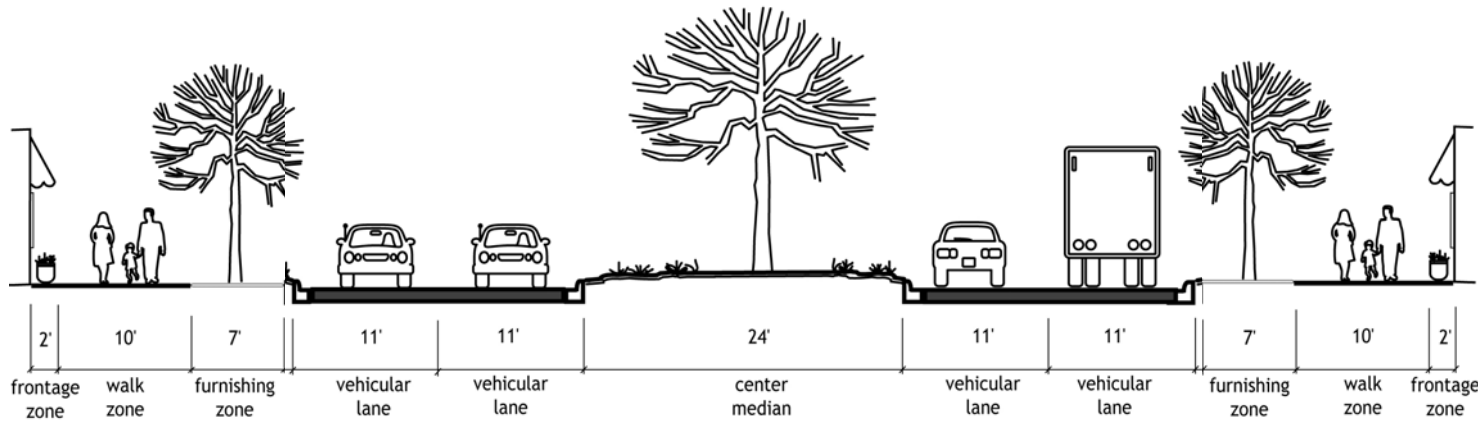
Parkway cross-section. Note: This drawing does not show on-street parking, but the parkway could accommodate it.
